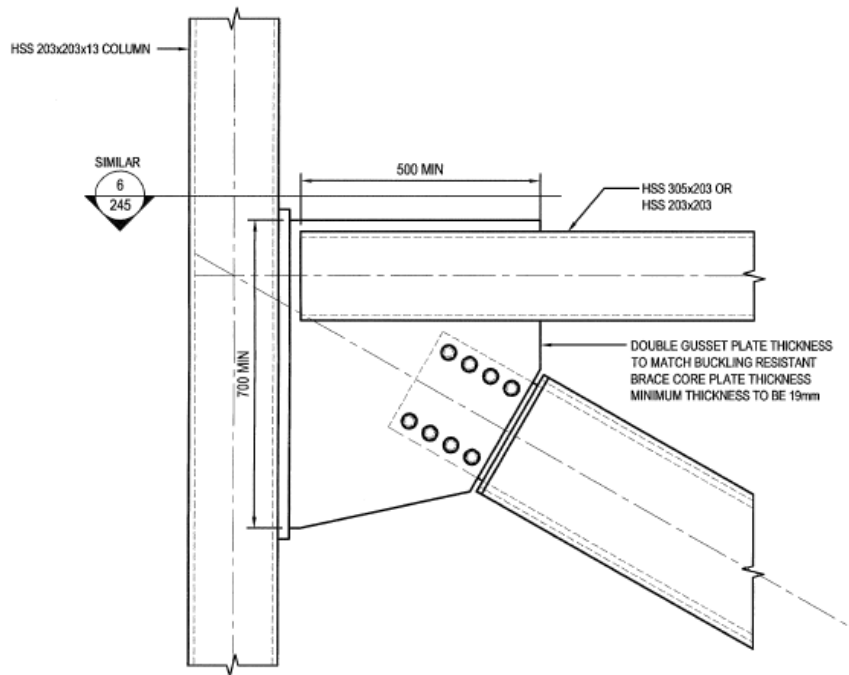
Upper connection detail (Structural tender drawings, 2010)
